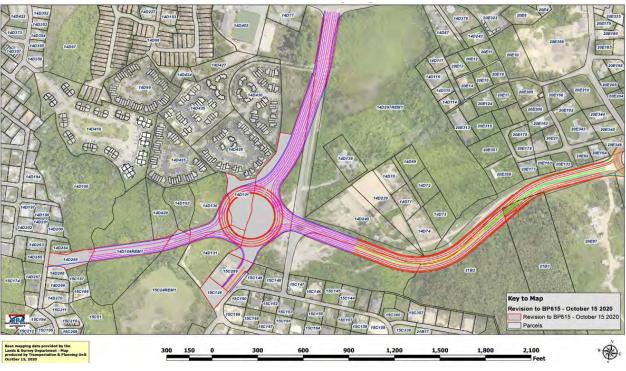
Proposed Linford Pierson / BTW Highway Works (under construction)
